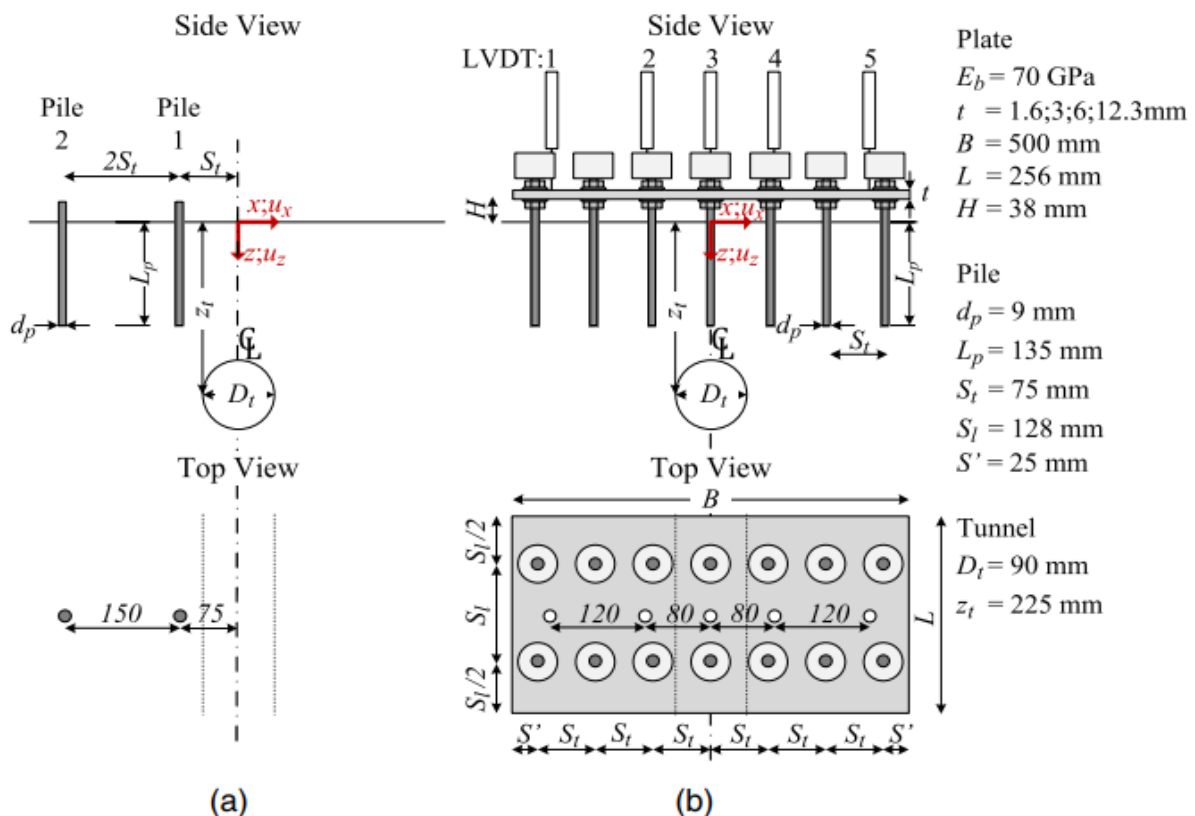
Test layout (in model scale): (a) loading tests (b) tunnelling beneath piled plate (Franza and Marshall, 2018)
